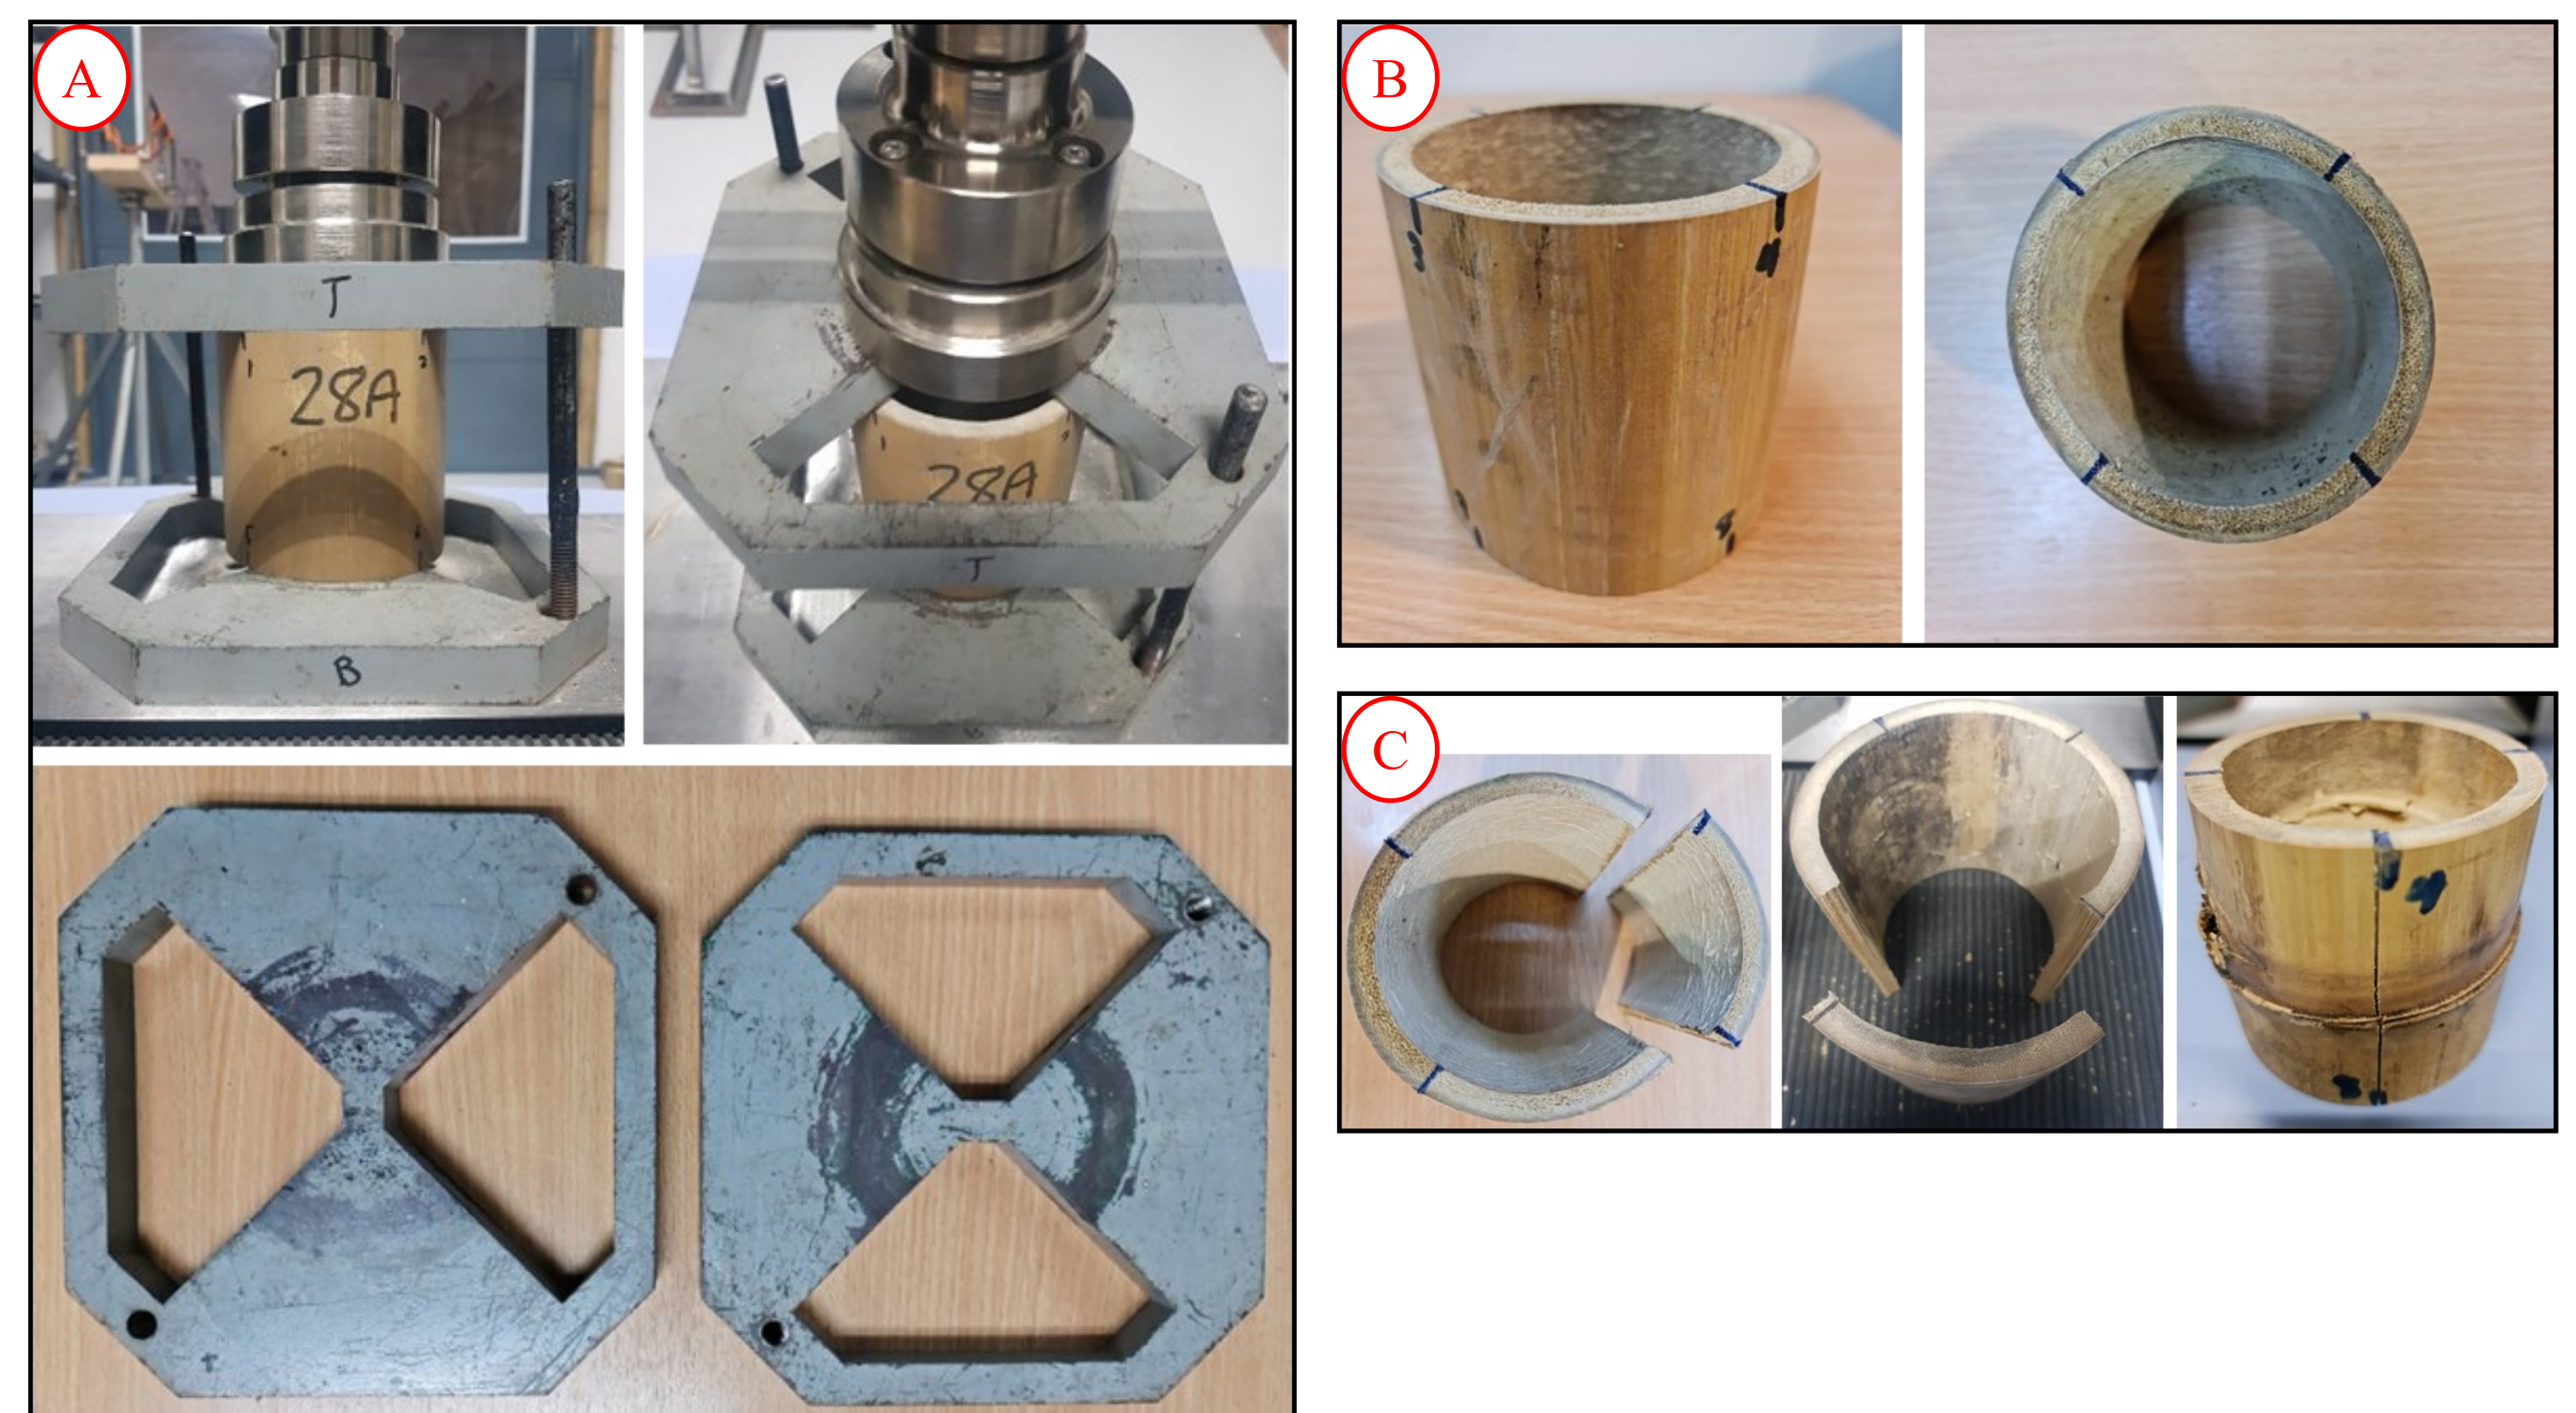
Shear Test Set-up: (a) ISO 22157 Set-up and Shear Plates, (b) Bamboo Test Specimen, and (c) Typical Mode of Failure
